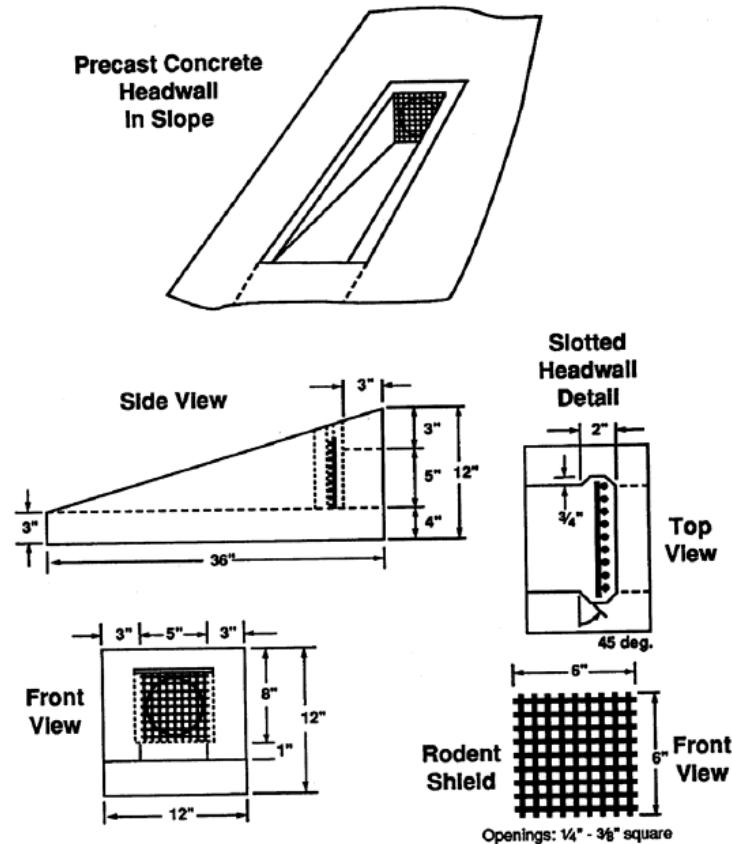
Drainage system outlet (Arika, Canelon, and Nieber 2009)
